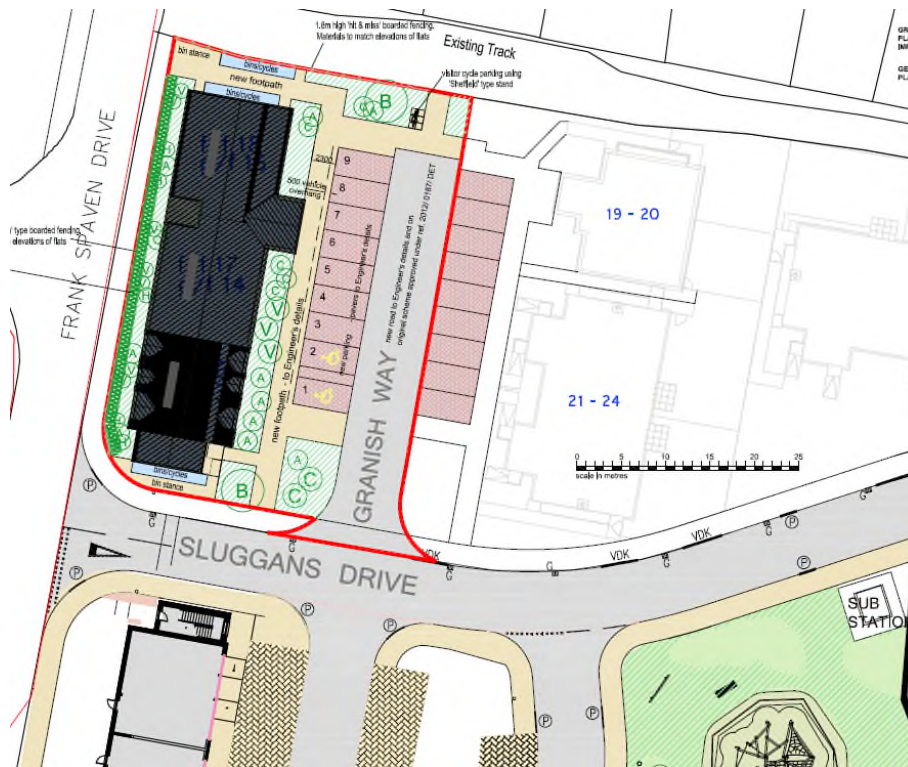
Proposed Site Layout (application 2013/0240/DET)
